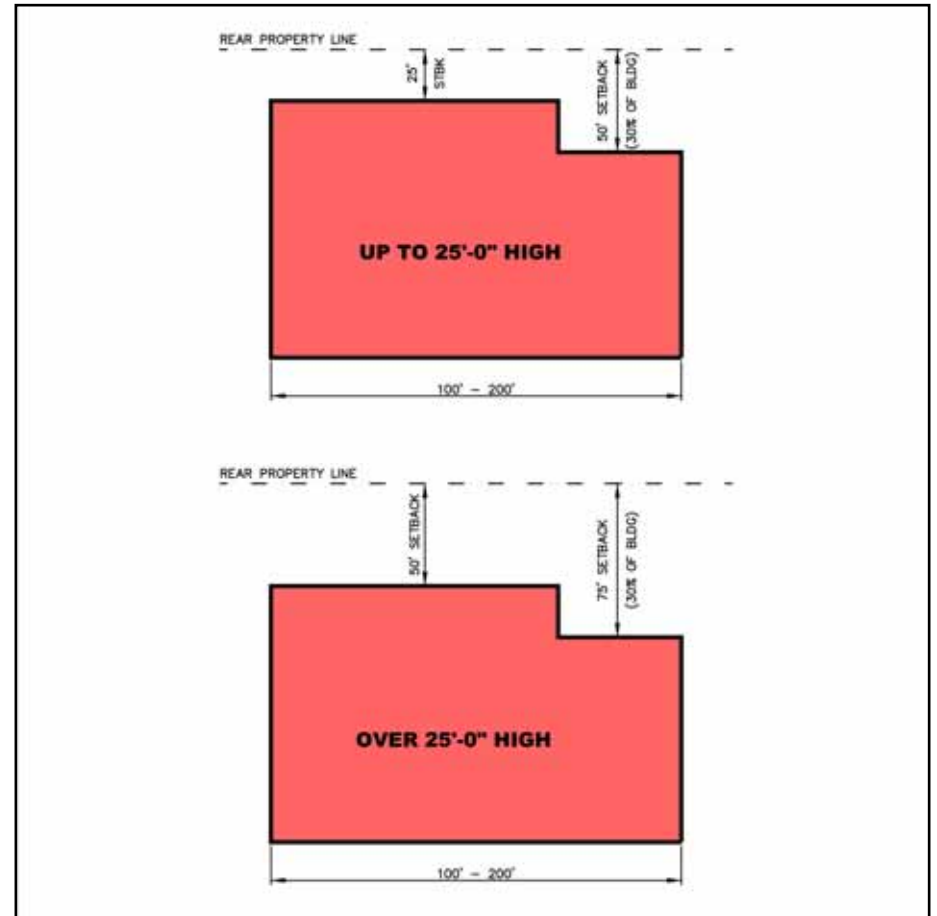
Setbacks for Buildings 100' to 200' wide on East side of Federal Highway
